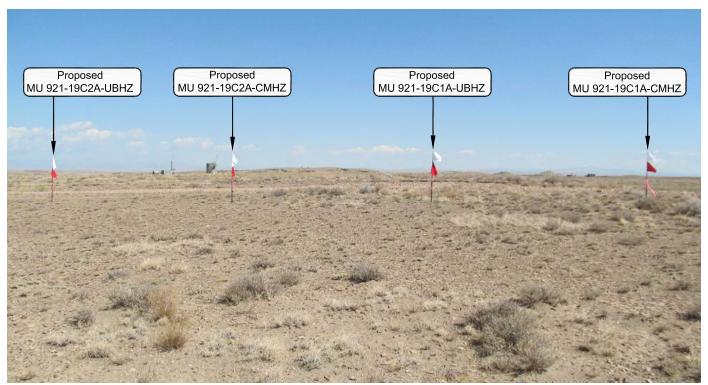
PHOTO VIEW: FROM LOCATION STAKES TO CORNER #1
